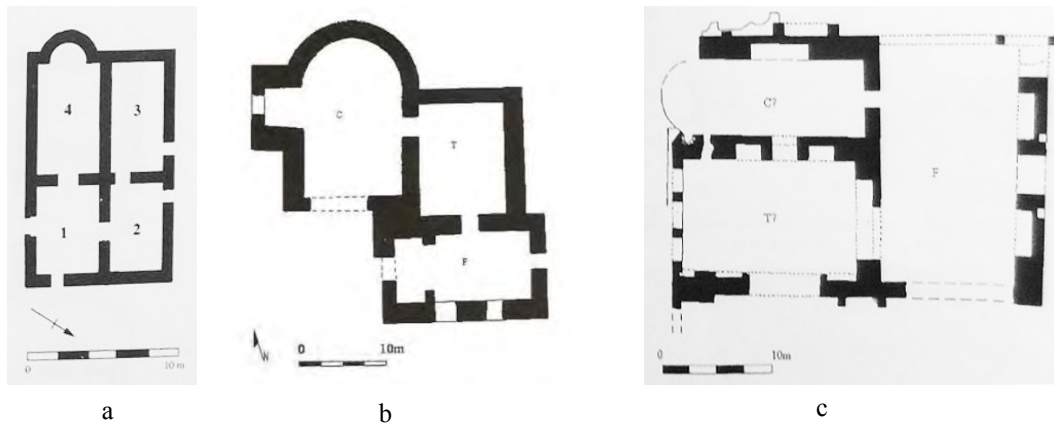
The plans of baths that do not have row-arrangement plan type
